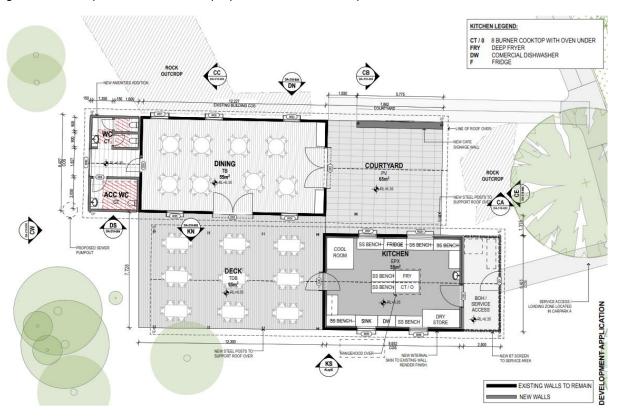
Excerpt of proposed cafe floor plan. Source: CKDS.
